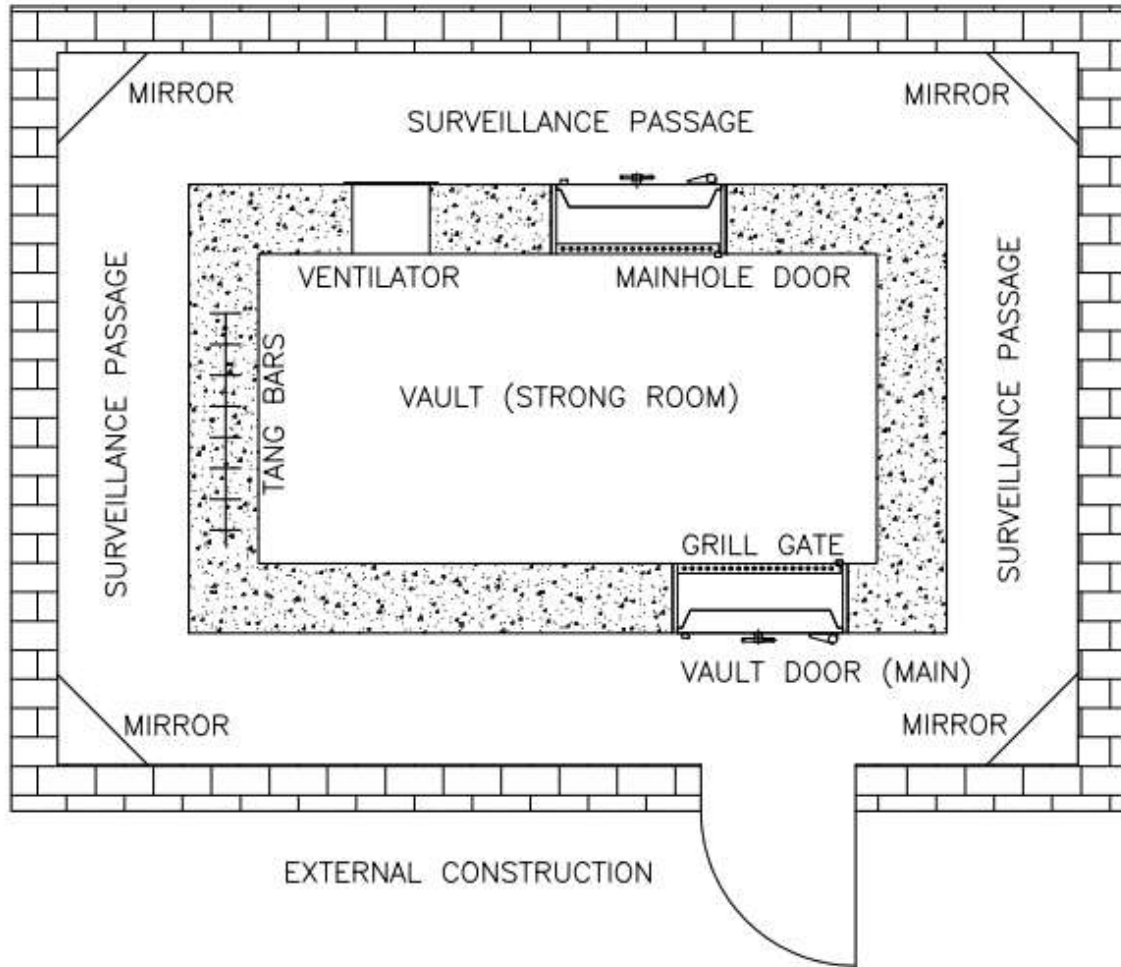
GENERAL LAYOUT OF VAULT (STRONG ROOM)
